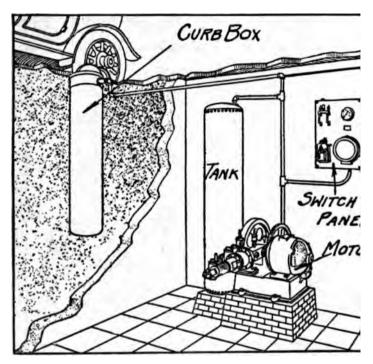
Sectional View Showing Hale Curb Box Installed with matic Air Compressor and Storage Tank.
